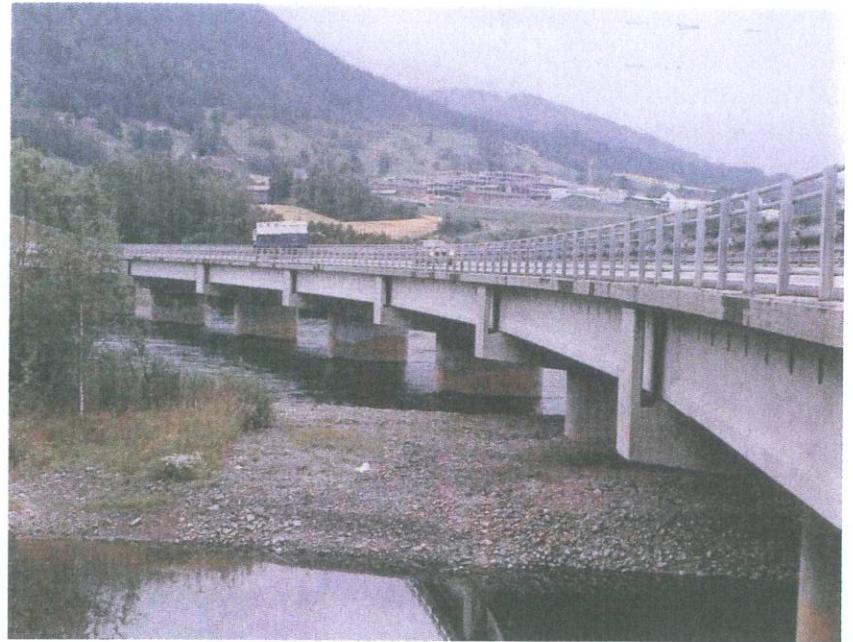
Precast bridge over watercourse with polygonal longitudinal profile
